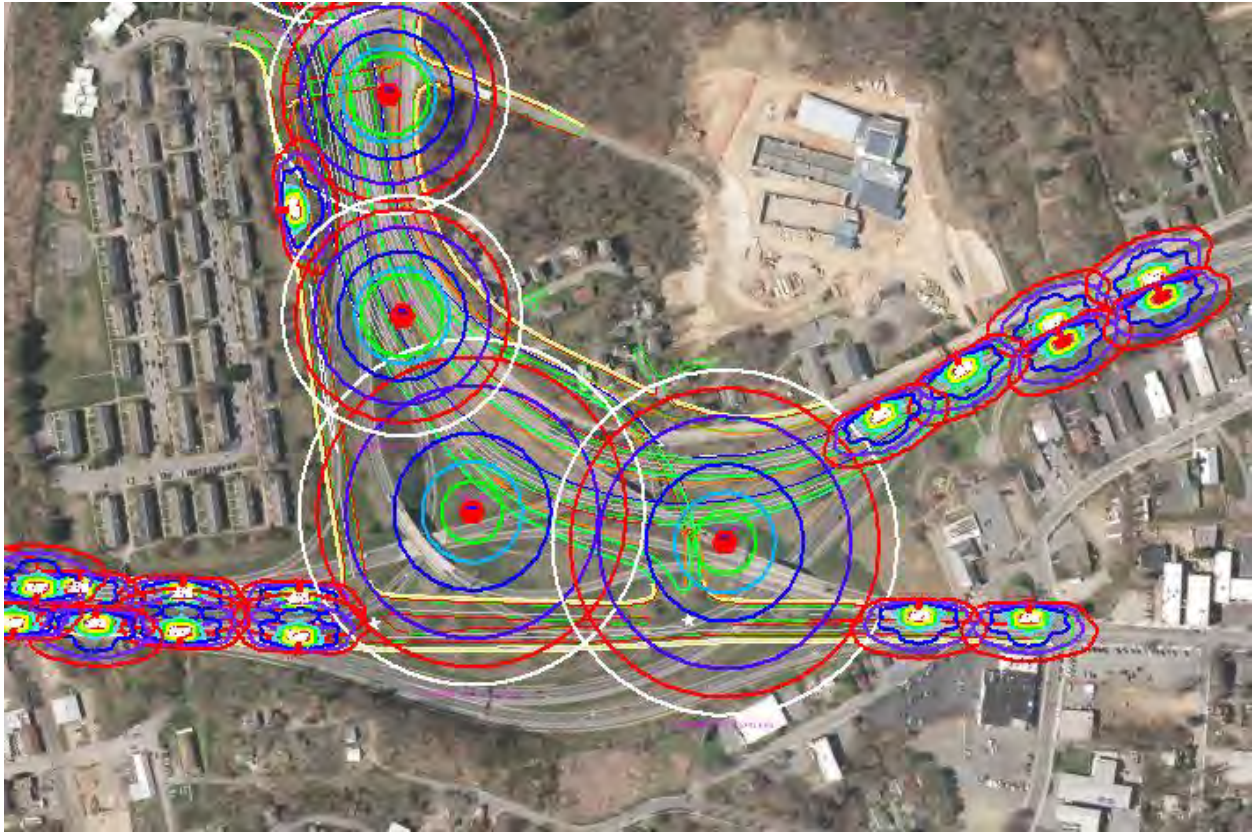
I-26/I-240/Patton Avenue Connector lighting layout.
